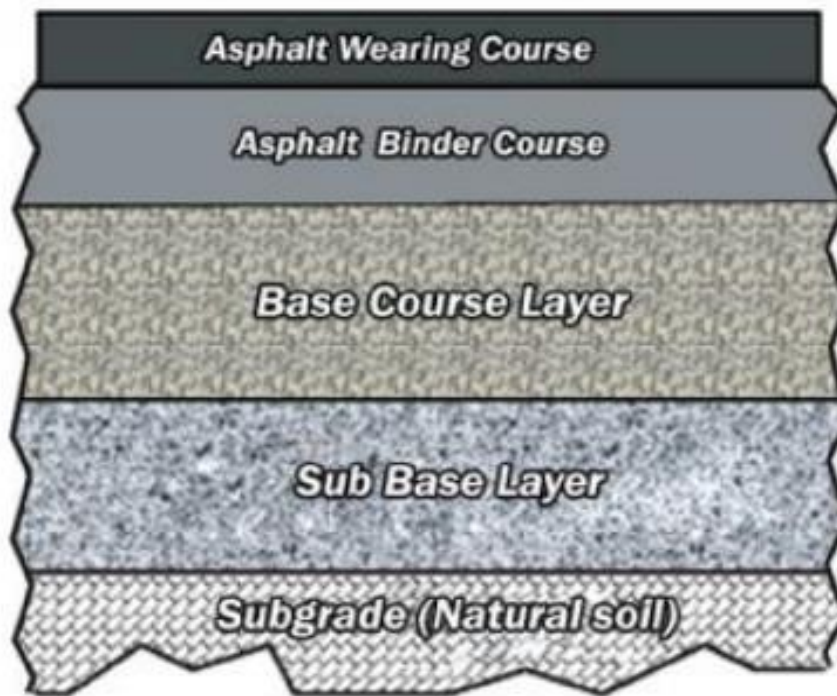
Typical flexible pavement vertical section structure (Mohammed, 2013)
